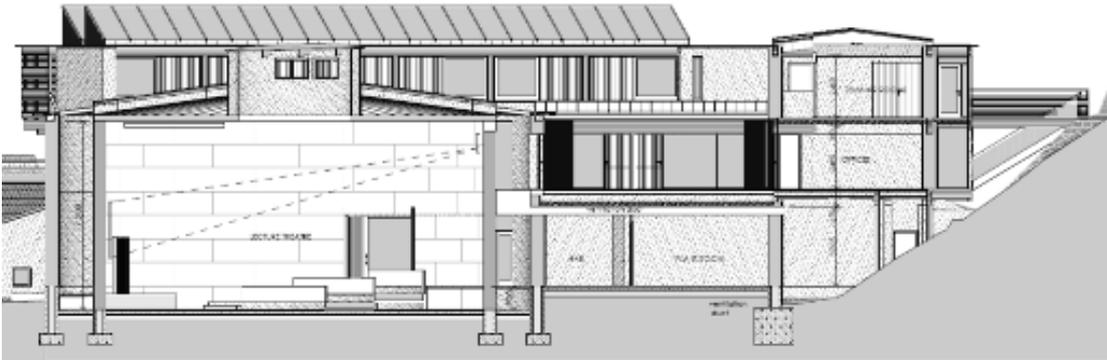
Architect's section, showing - theatre (left); study bedrooms (right)
